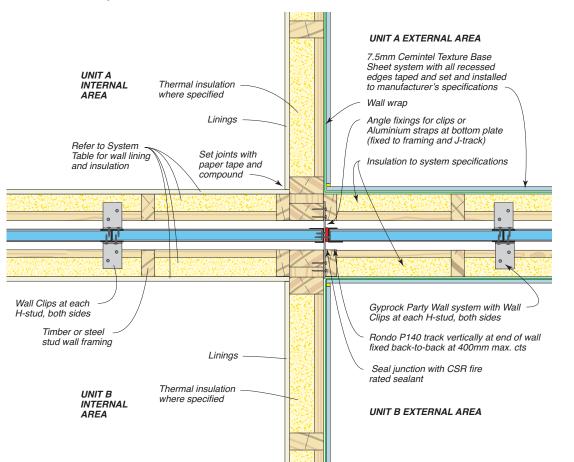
Junction Of Party Wall And External Wall With Cemintel Texture Base Sheet - Plan View
